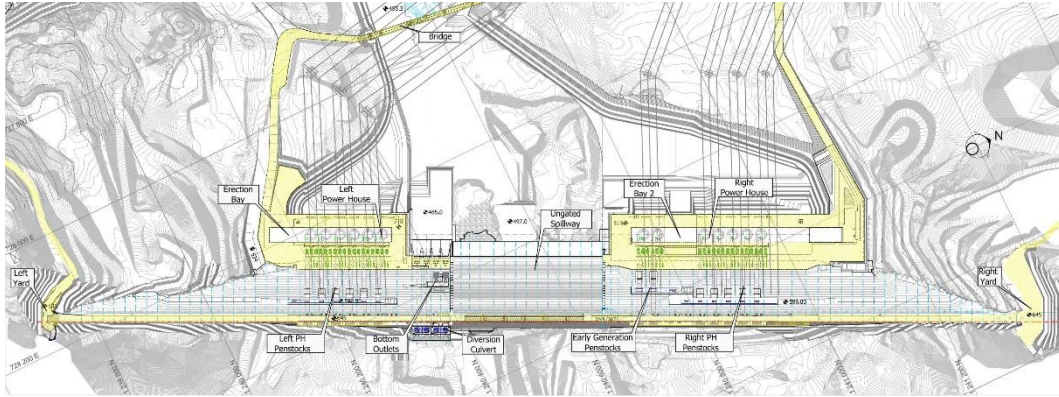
GERdp hydroelectric project, Main Dam general layout plan view.
